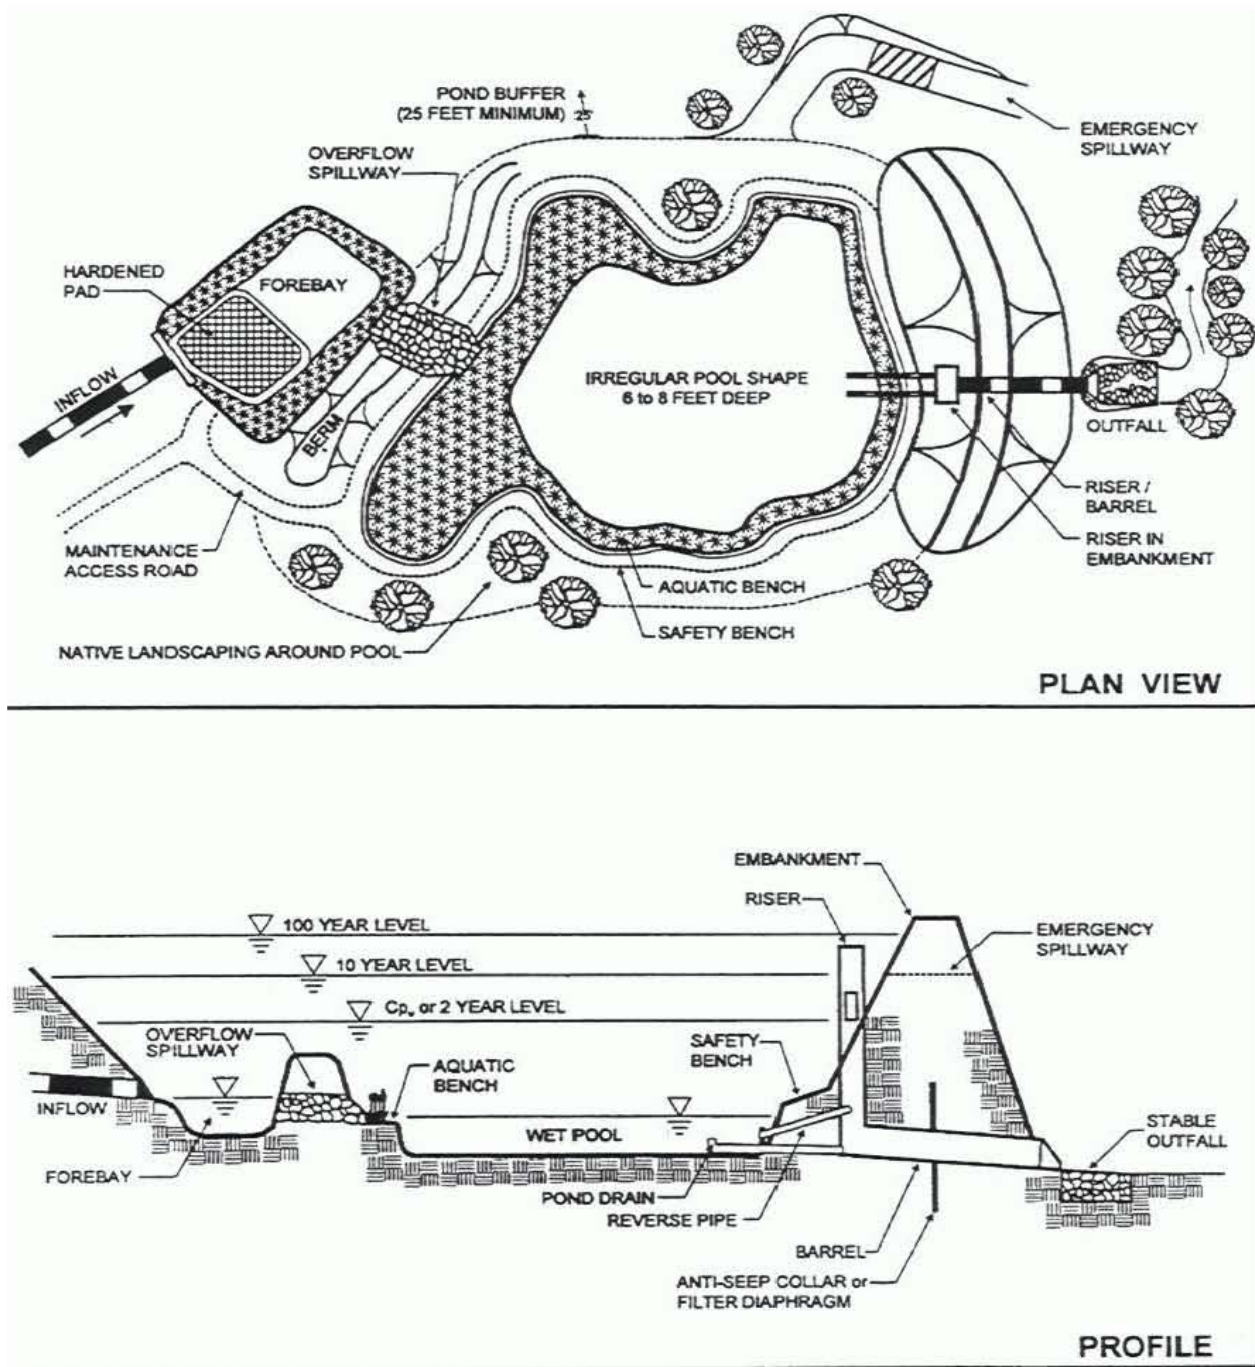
Wet Pond Typical Detail (MDE, 2000)
